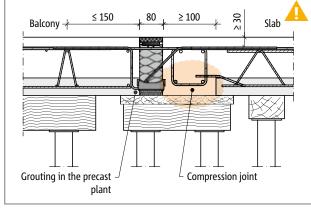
Schöck Isokorb® T type K/KF: Indirect support, installation in conjunction with prefabricated slabs(here:  $h \le 170$  mm), compression joint on the floor side
